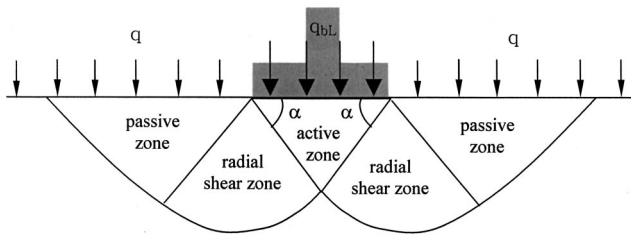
Typical failure mechanism of axially loaded footing
